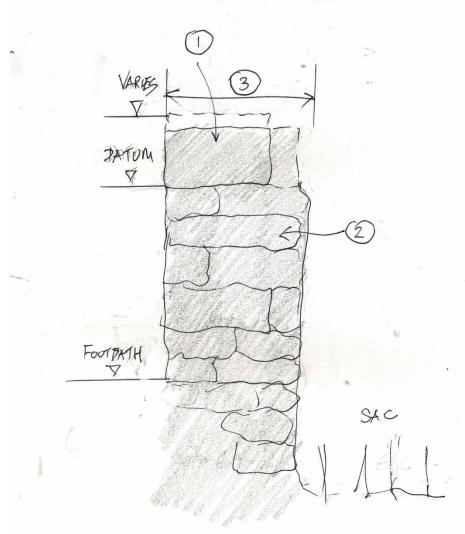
/CR1 New railing for Island Bridge House. Missing masonry to be replaced and the entire inside of the parapet to be repointed. No work is proposed to the outside face of the causeway. See SA specification.
